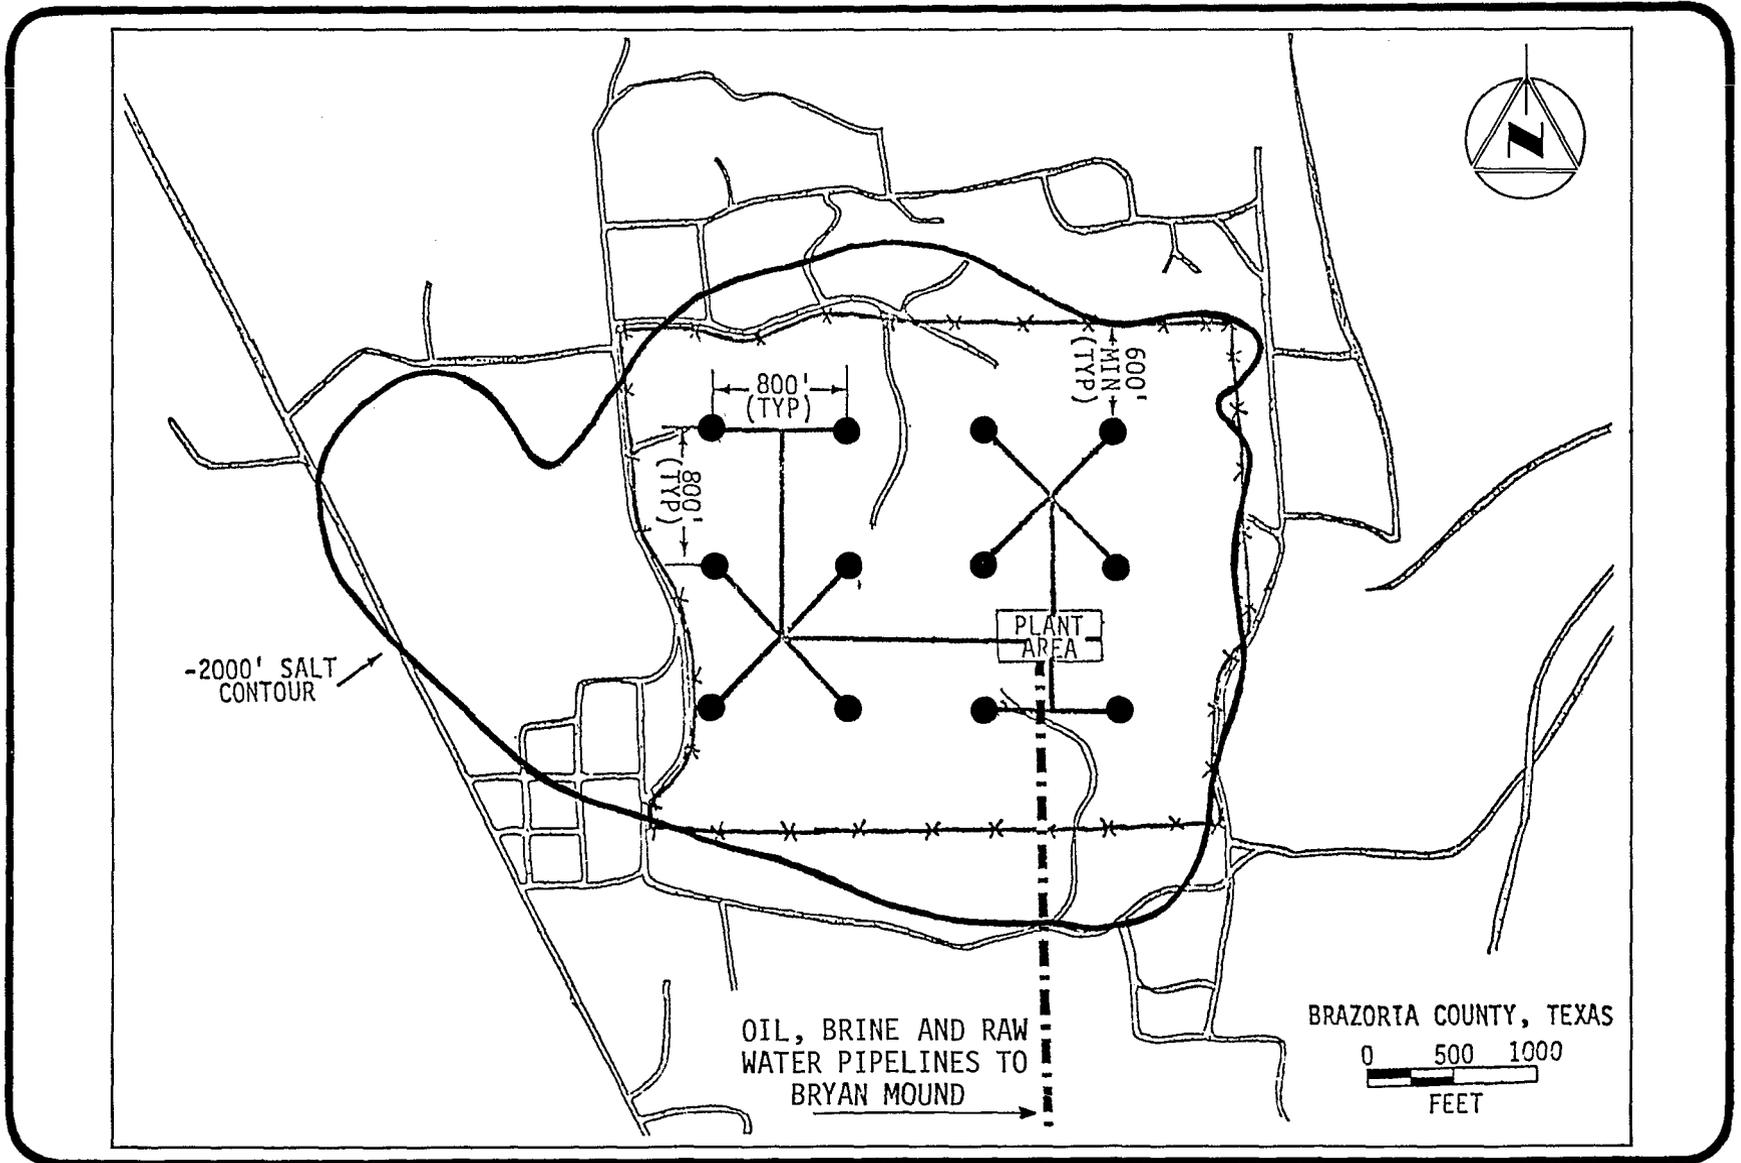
Site map - West Columbia dome candidate SPR storage site (alternative site).
